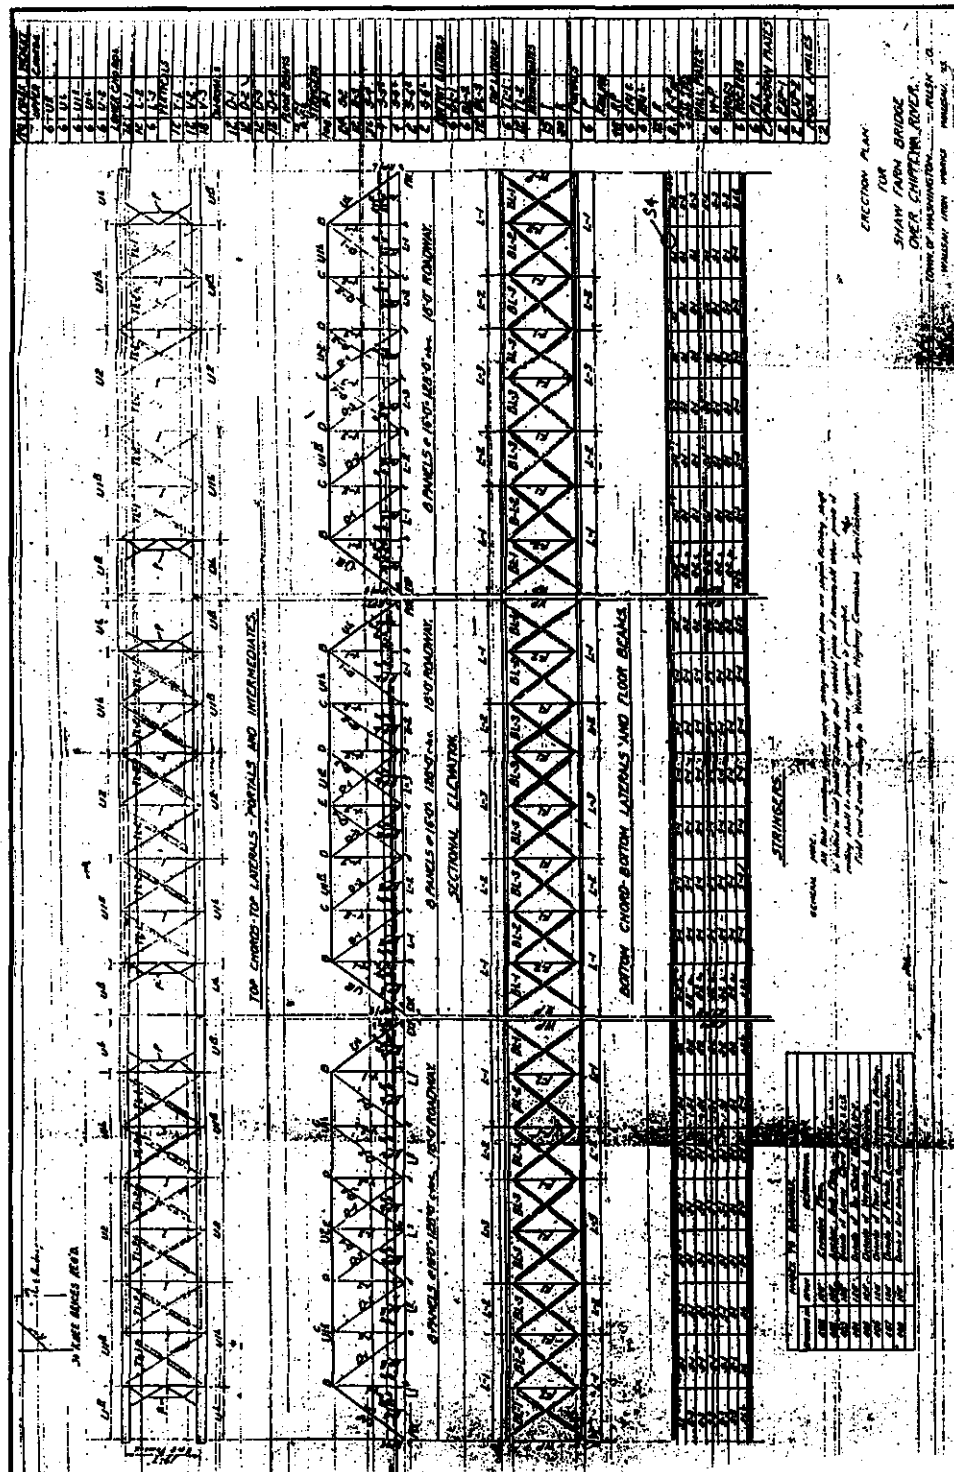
Wausau Iron Works, "Erection Plan for Shaw Farm Bridge Over Chippewa River."
